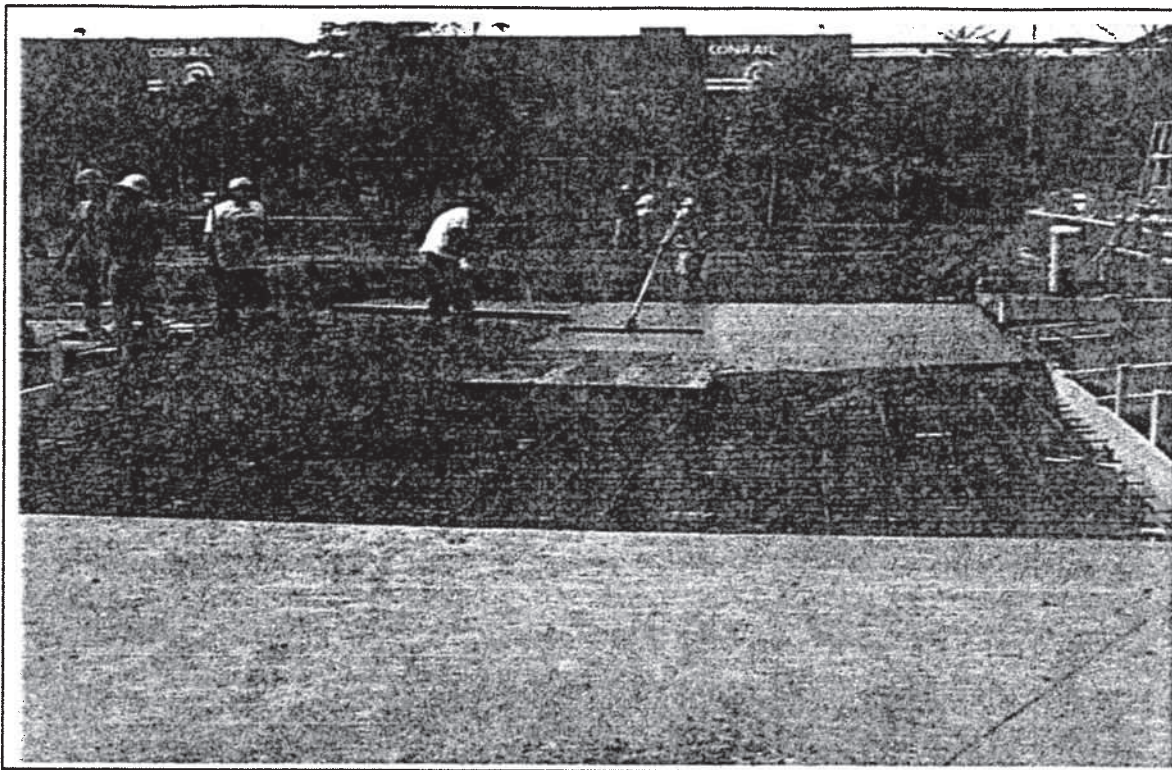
Looking southward across western trench at top of clay backfill elevation.
